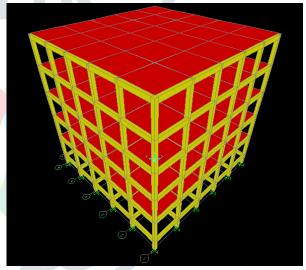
5 Storied Building Without Water Tank – 3d View
